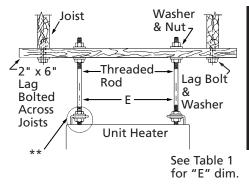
Heater Mounting 100/400 MBTU Sizes – Wood Construction
